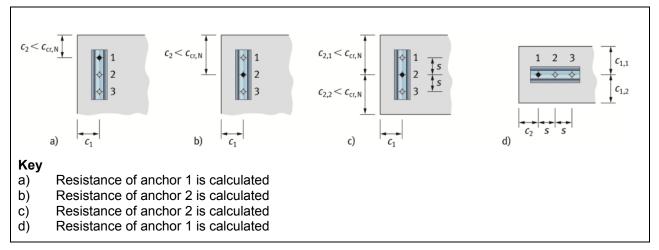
Definition of the corner distance of an anchor channel in the corner of a concrete member
